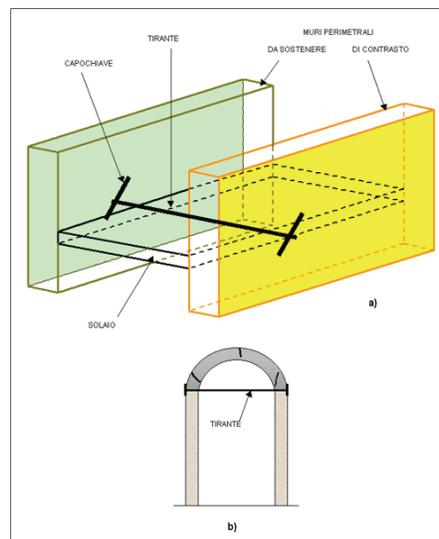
(a) Rods on walls and (b) rods on cracked arch
